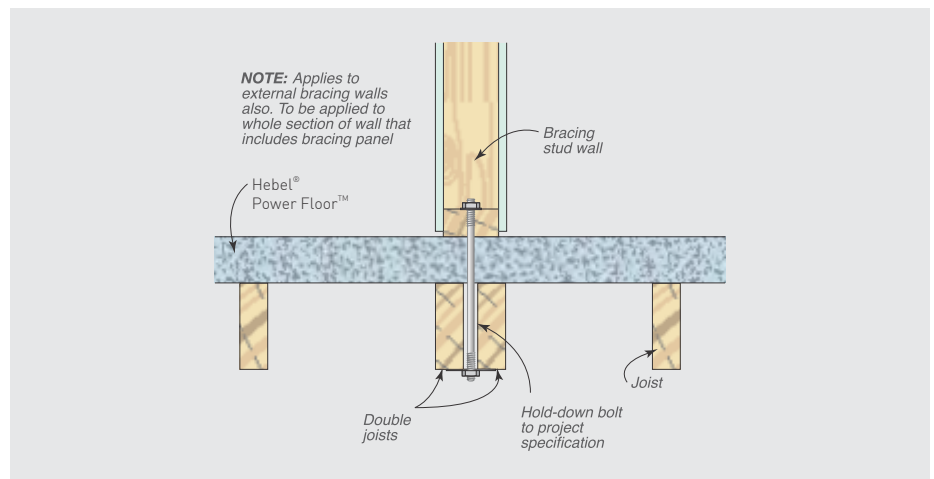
Hold-down of Internal Bracing Wall Parallel to Joists on Platform Floor.
